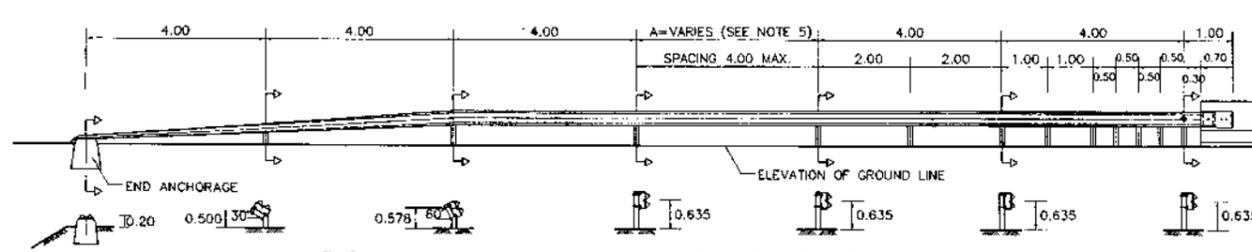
DETAIL "A" WITHOUT BRIDGE SIDEWALK
